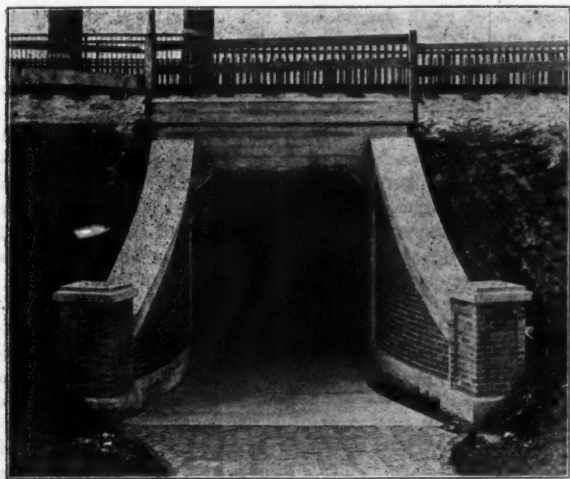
Reinforced Concrete Passenger Subway at Flossmoor—Wing Walls Faced With Brick.
